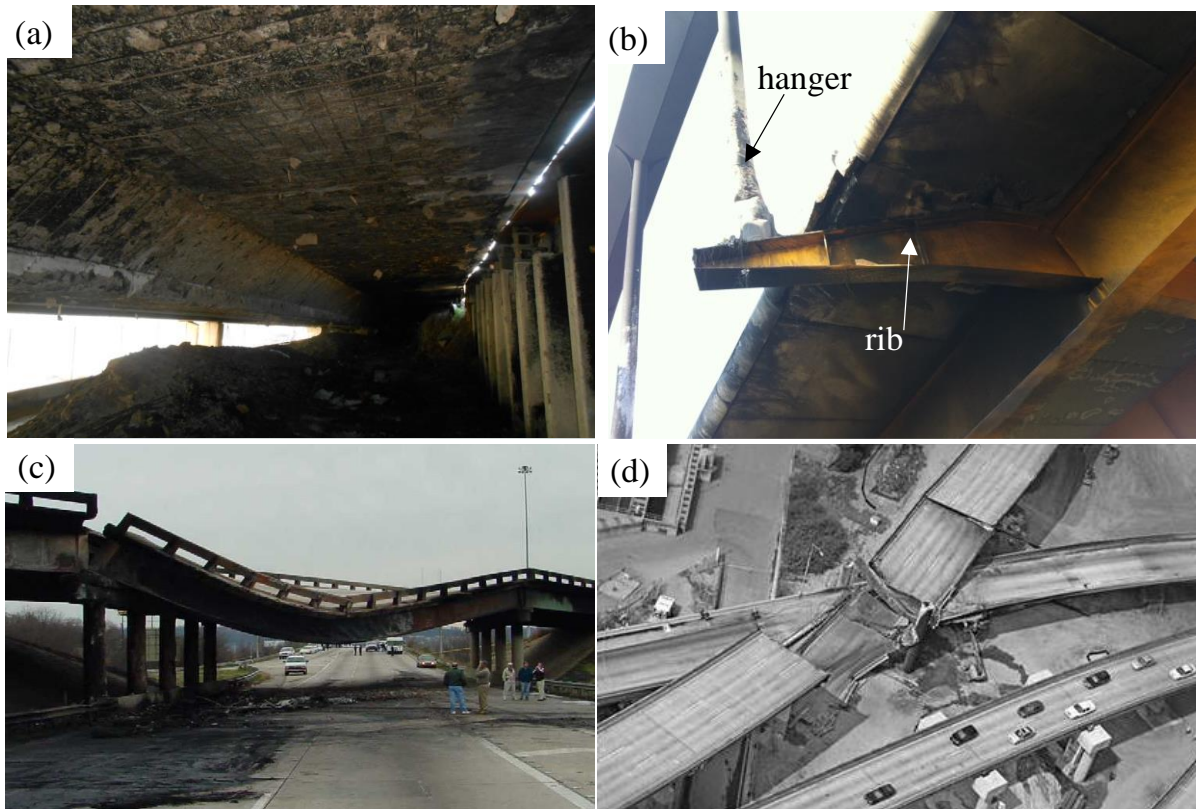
Some examples of bridge damage levels. (a) Damage level 2: concrete spalling after a fire in a prestressed concrete bridge in Madrid, Spain. Image courtesy of Ines Ingenieros Consultores. (b) Damage Level 3: hanger and rib of a bowstring bridge in Castilla y León (Spain) that had to be replaced. Image courtesy of A.T.P. Ingeniería S.L.. (b) Damage Level 4: I-20/I-59/I-65 interchange in Birmingham, Alabama, USA. Image courtesy of the Alabama Department of Transportation (c) Damage Level 5: Collapse of a portion of the MacArthur Maze in Oakland, California, USA. Image courtesy of Robert Campbell.
